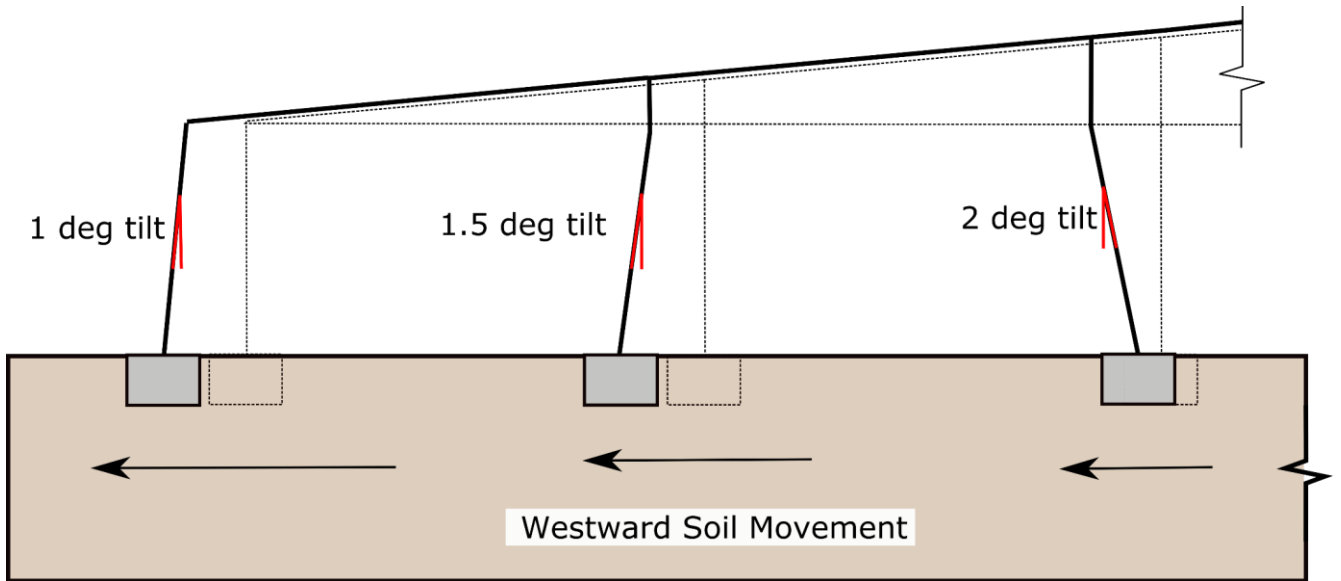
Schematic of deformation pattern of steel frame along the north wall of CS building (three west-most columns of the Shed; looking north from interior).
